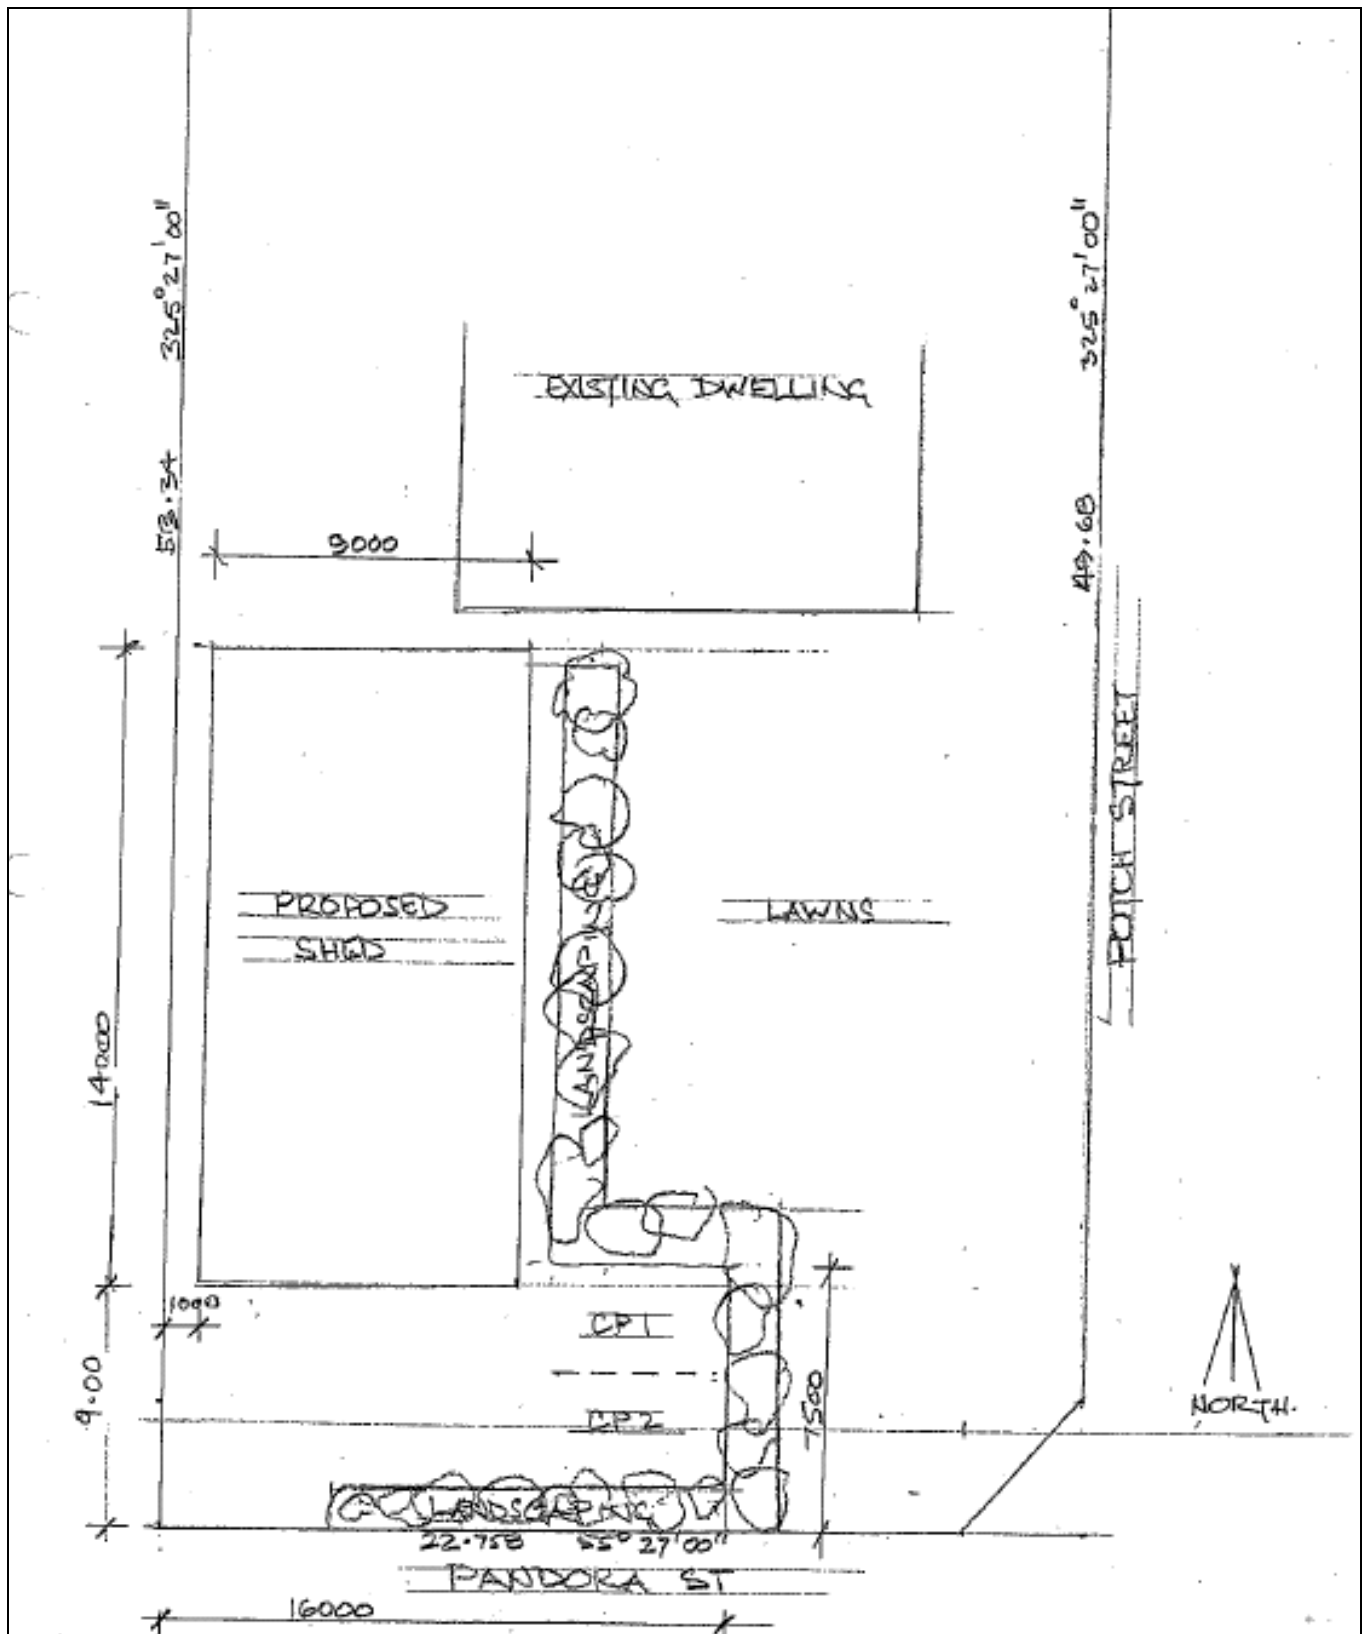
SITE PLAN (INCLUDING PROPOSED LANDSCAPING)
